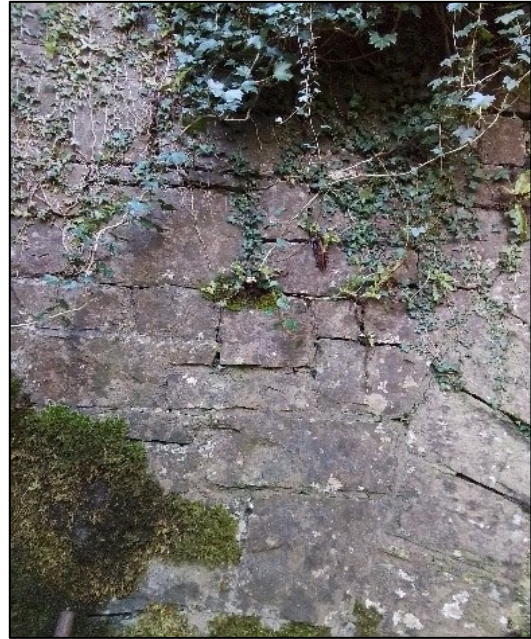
Gaps between the stonework and small amount of ivy growth of the external wall.
